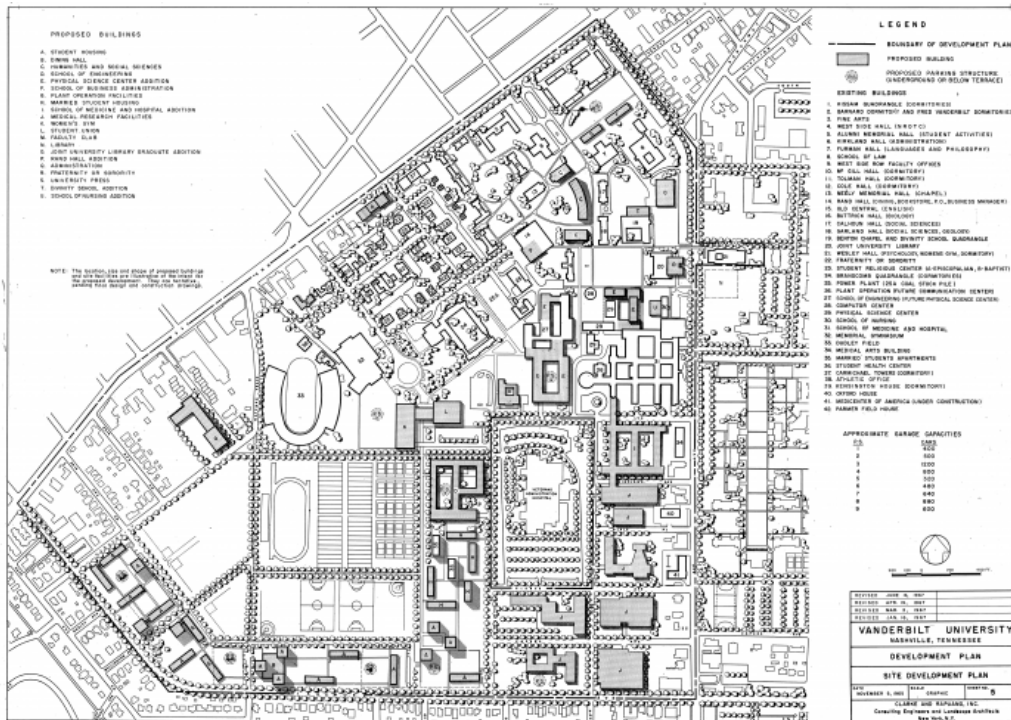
Example of a master plan. Development plan of Vanderbilt University Campus, Nashville Tennessee. Engineering and Landscape firm: Clark and Rapuano, 1965, extending architect Edward Durrell Stone's 1940 master plan. Source: <https://www.vanderbilt.edu/futurevu/history.php>
